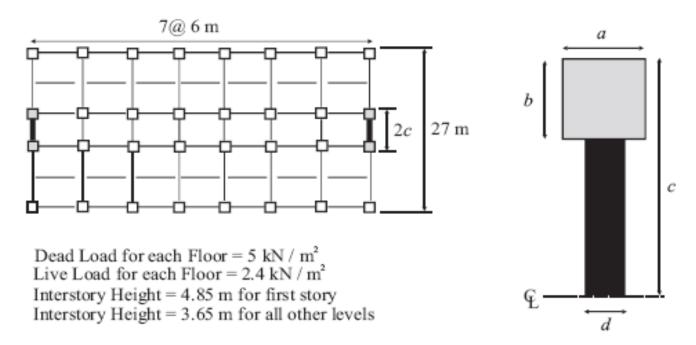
Layout and Design Loads for 10-Storey Building Model
